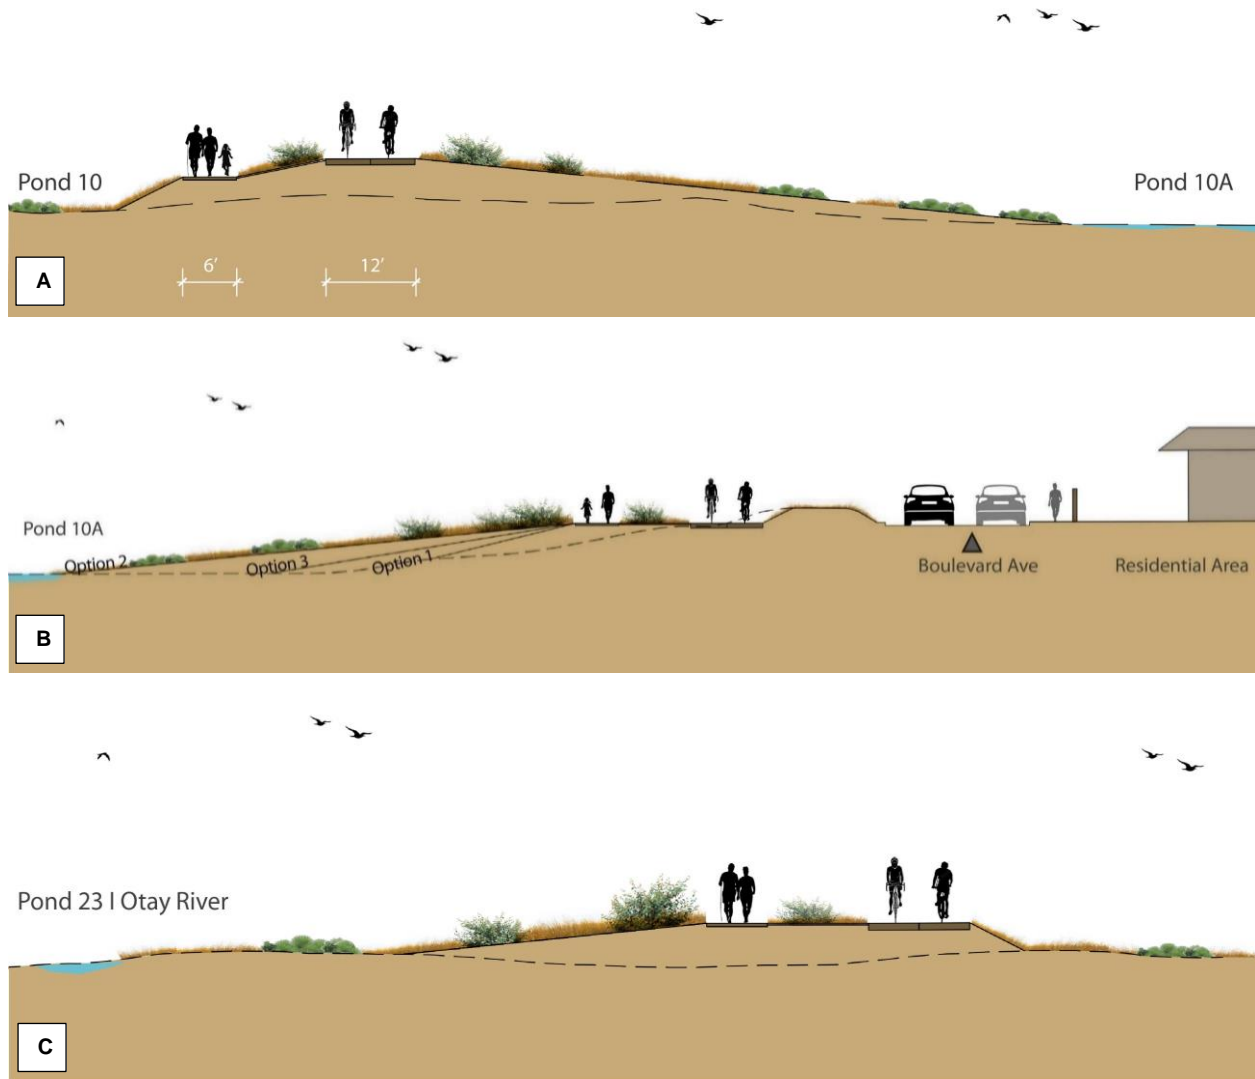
Alternative 1 – “Elevate in Place” Conceptual Cross Sections
